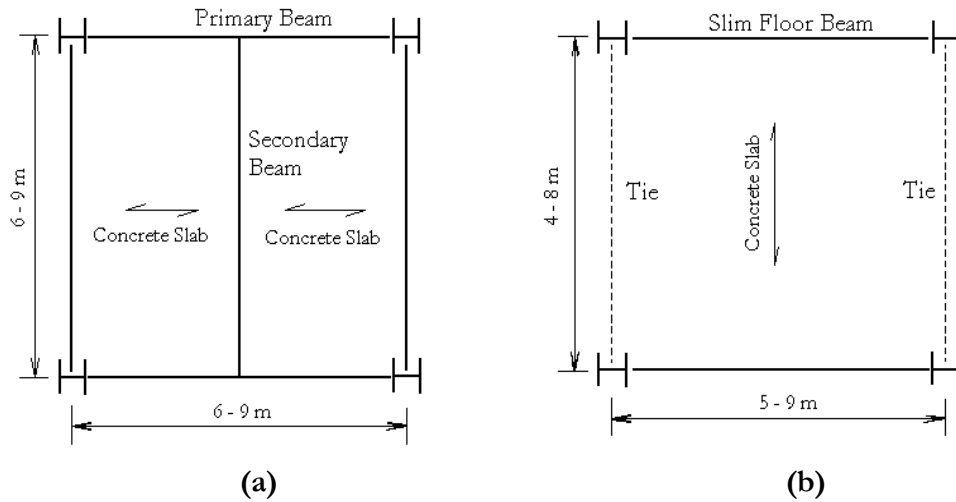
Composite Frame Systems: (a) Traditional Primary - Secondary Beams System; (b) Slim Floor System.
